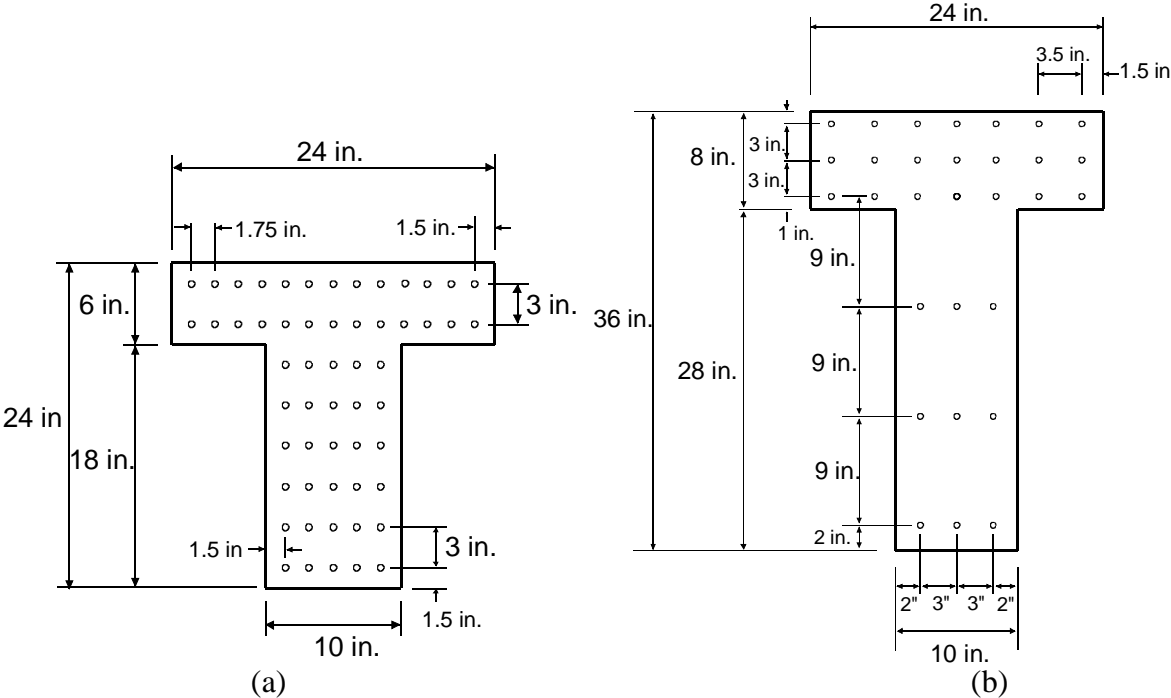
Copper tube layouts for (a) Prototype beam and (b) Laboratory segmental beam
